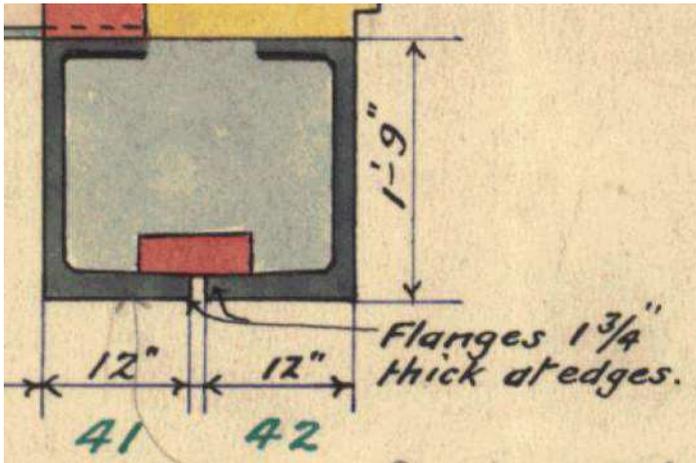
Girders 41 and 42 (North London Railway Drawing)
